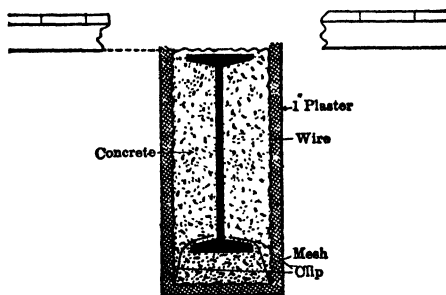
Fireproofing of Steel Beam with Concrete and Plaster
